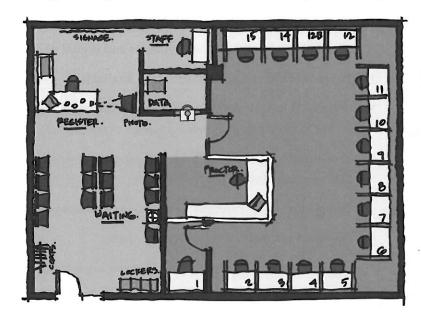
This sample floor plan of a PPC demonstrates the industry-leading, secure test center design.
